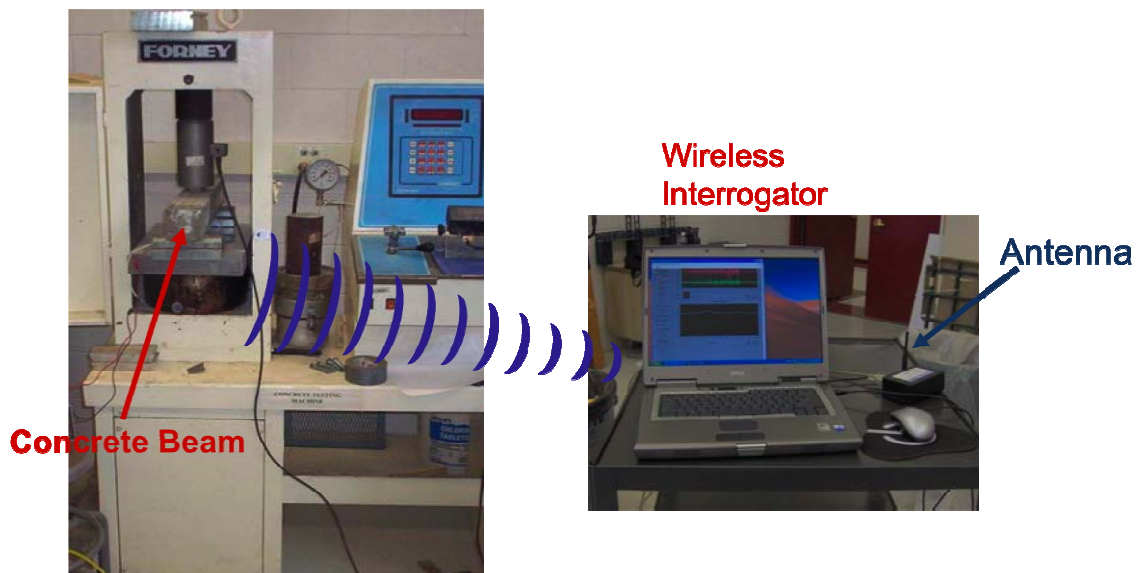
Typical setup for the wireless damage detection system in the concrete beams with embedded cement-CNT sensors.
